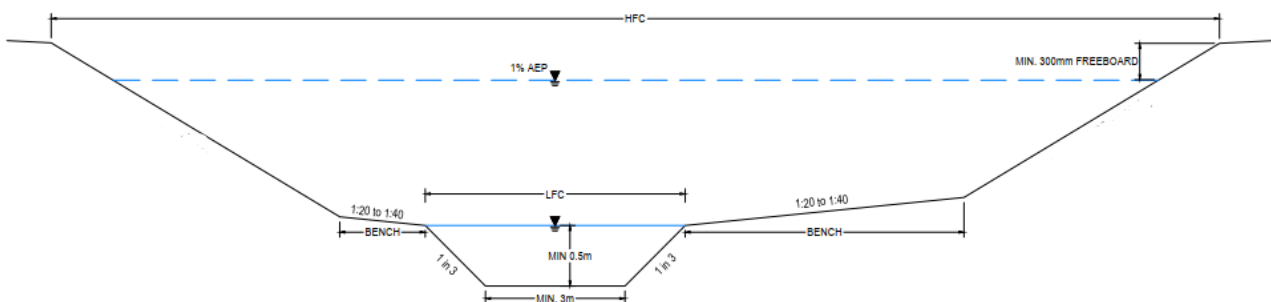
TYPICAL COMPOUND WATERWAY CROSS-SECTION (SOURCE: MW CONSTRUCTED WATERWAY [STANDARD DRAWING](#))
